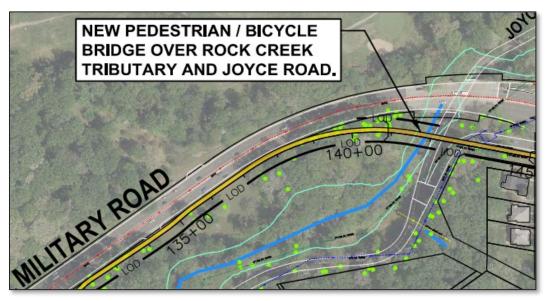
Proposed Bridge over Joyce Road and Rock Creek Tributary
